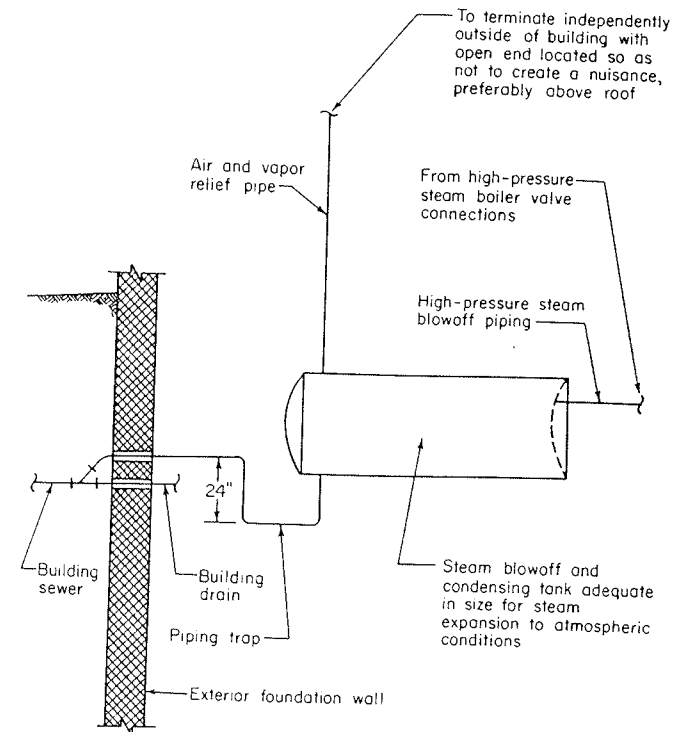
High-pressure steam blowoff tank connection to drainage system.
